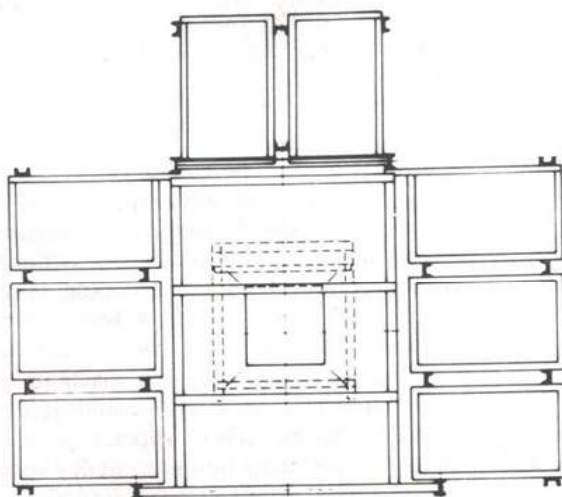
Plan of bunker arrangement used with mobile-crane material transfer.
